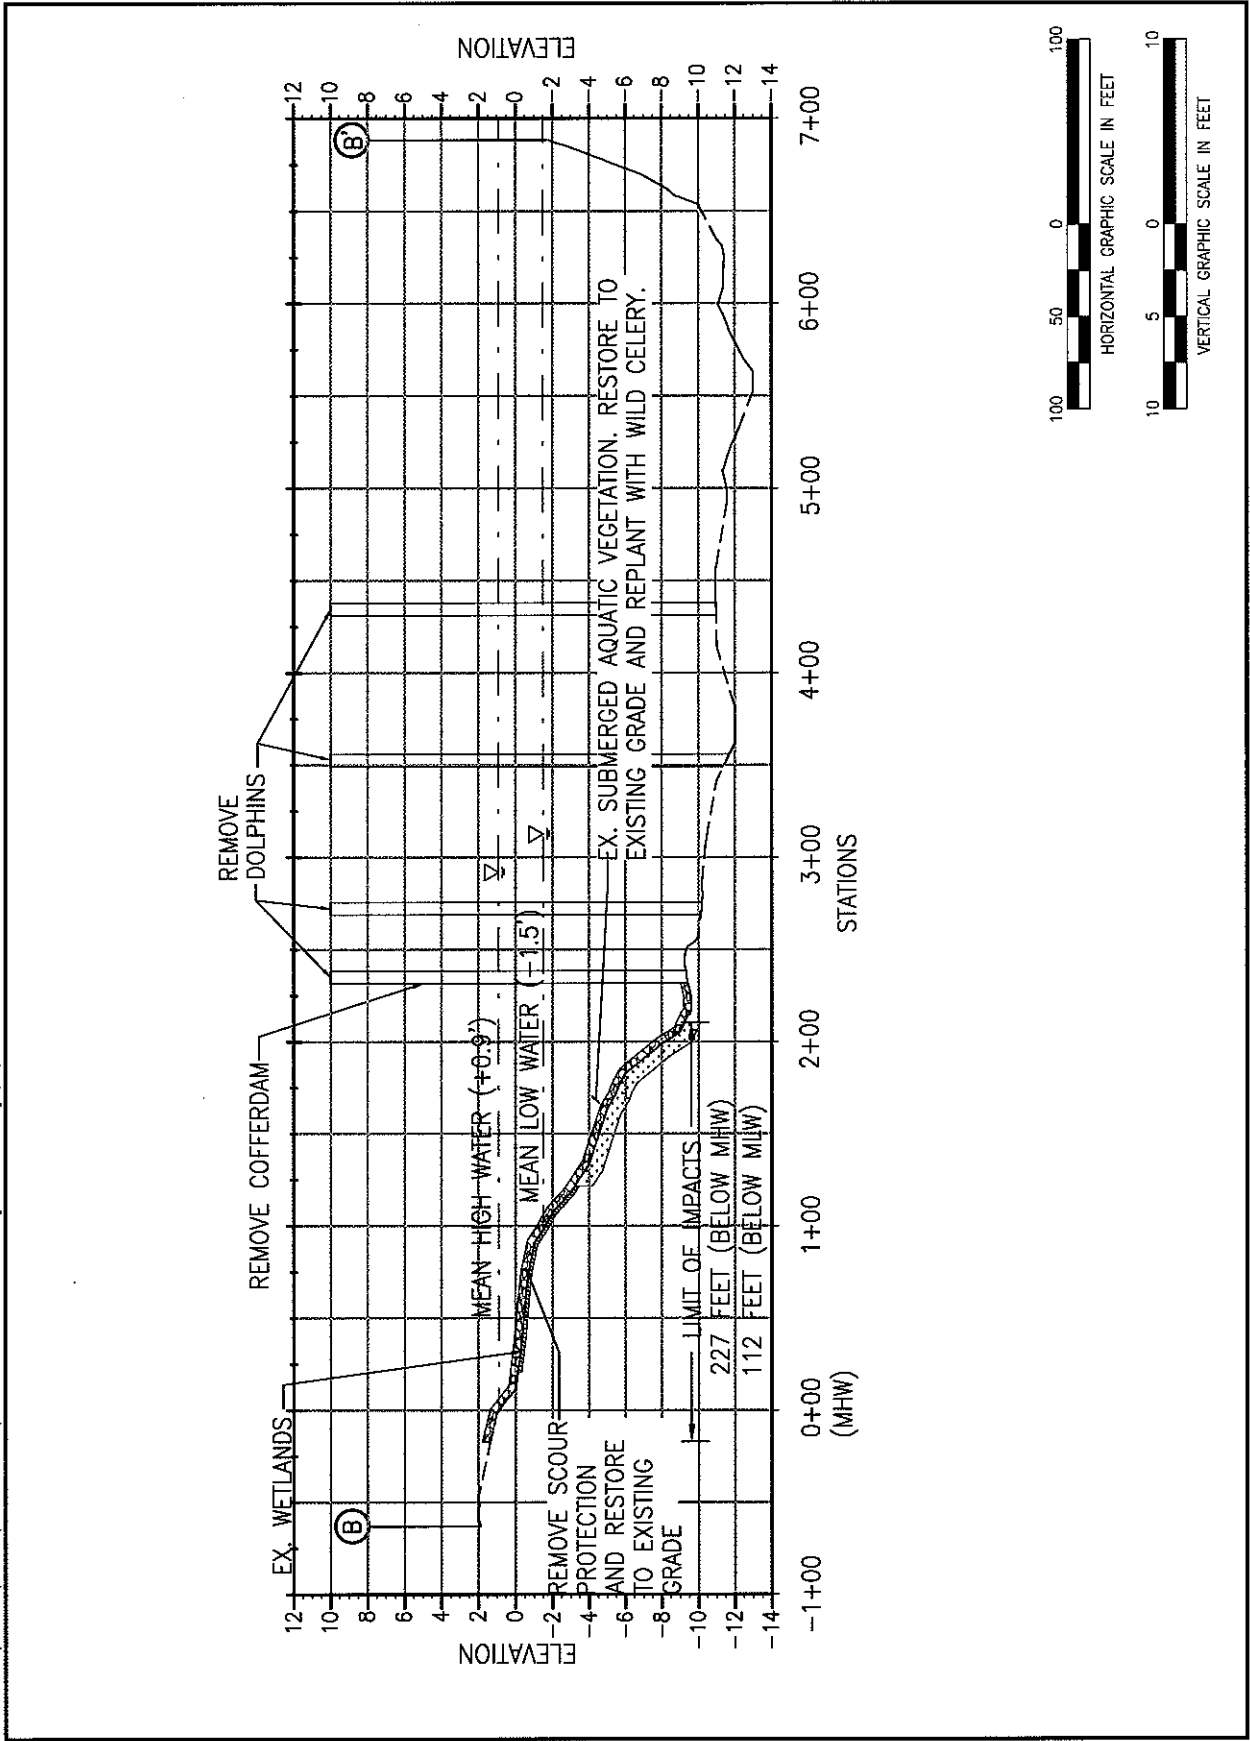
SUBMERGED AQUATIC VEGETATION (SAV) RESTORATION PLAN, LARGE COMPONENT TRANSPORT ROUTE ROLL-OFF FACILITY CROSS SECTION B - B'
